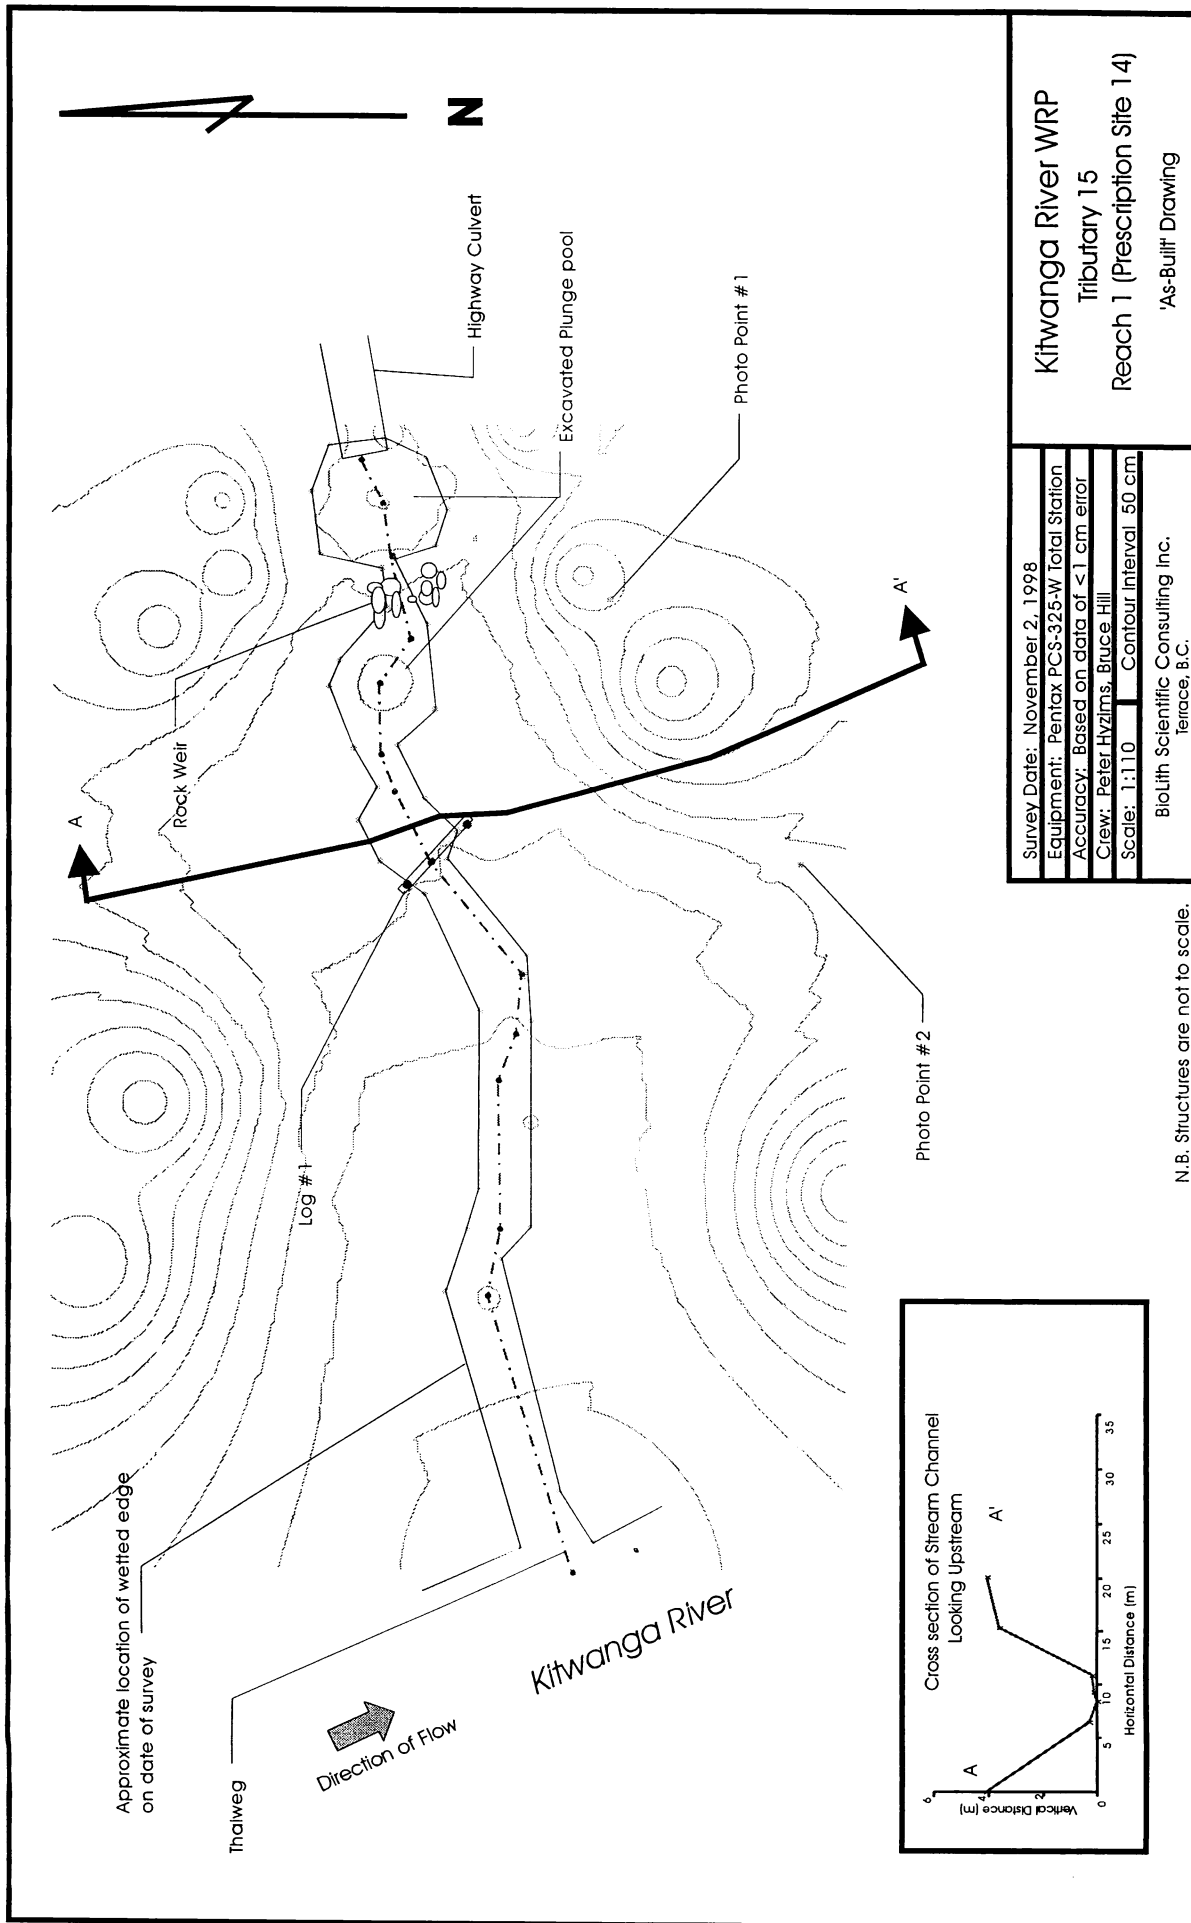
As-Built drawing of the construction at Site 14 on Tributary 15 in the Kitwanga River South Sub-Basin.
